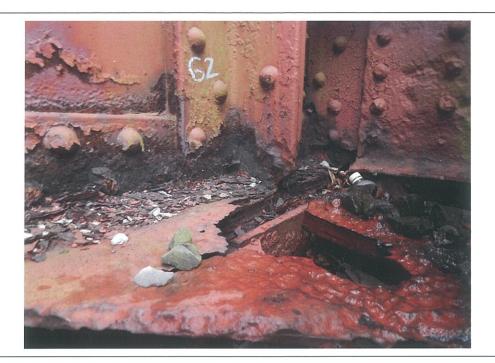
Severe section loss and holed through gusset plate at the south side of Girder G2 bearing over the east abutment, looking northeast.
